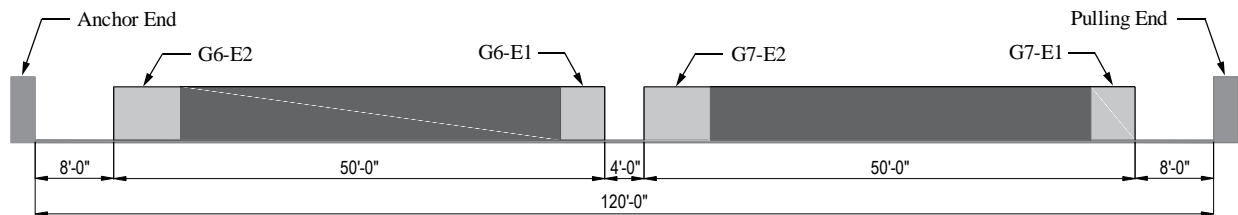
Elevation view of FIB 54 girders in casting bed
